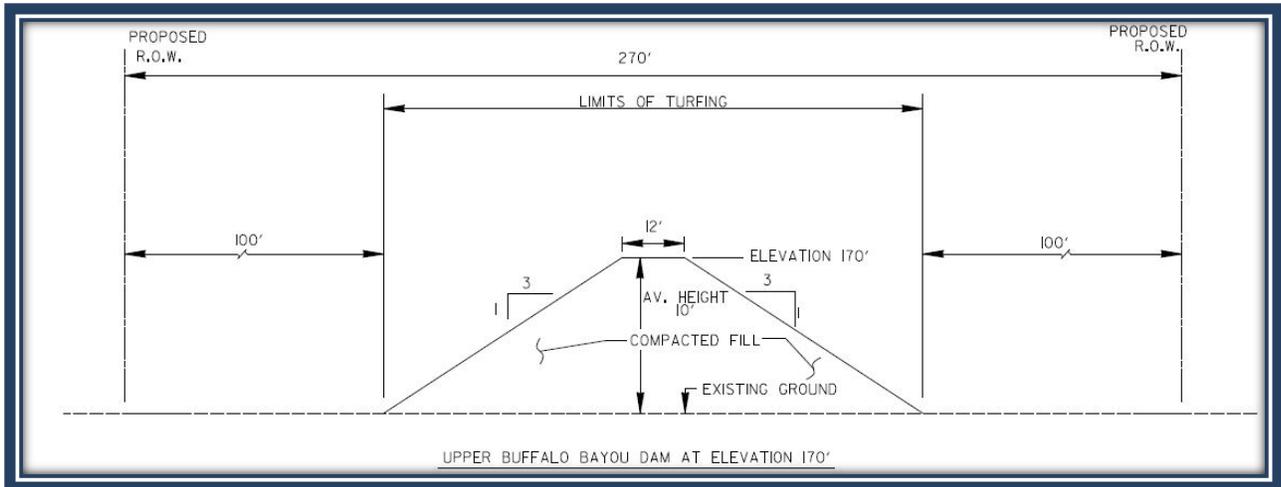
Typical Upper Buffalo Cross Section (Res3a)
